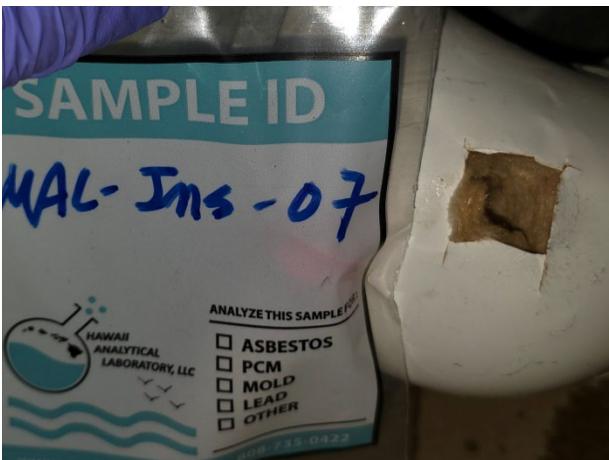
Sample ID: MAL-Ins-07 White wrap and light yellow insulation, Above Drop Ceiling. Recreation Room.
